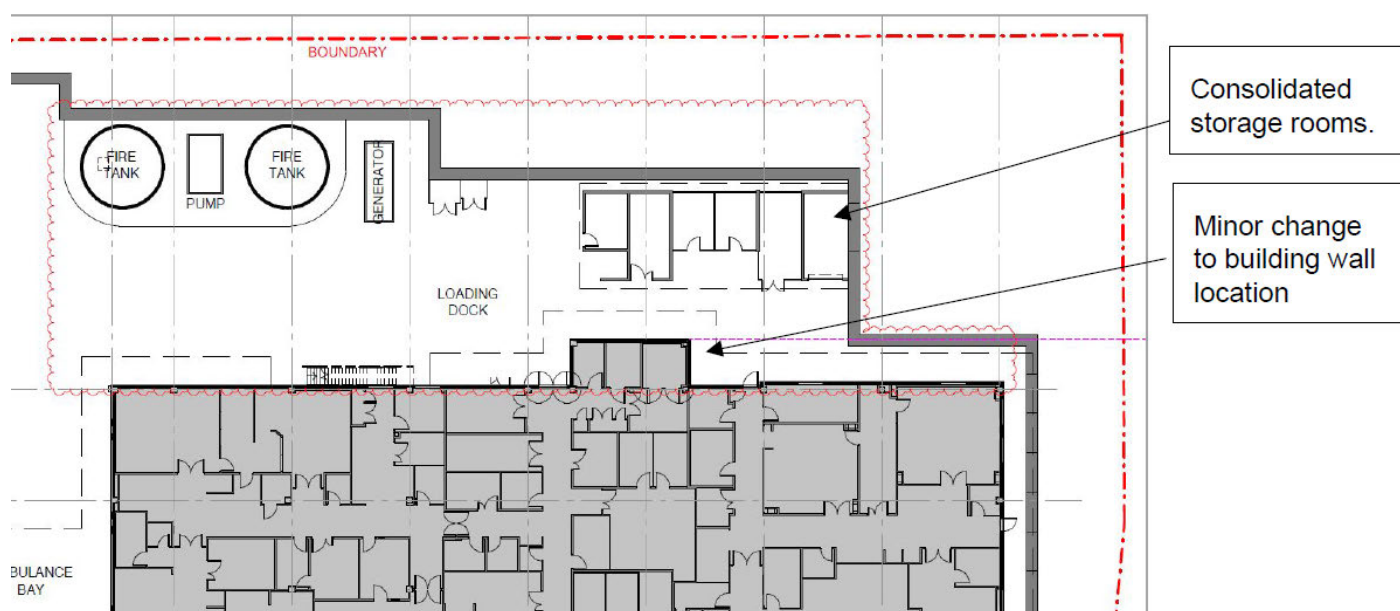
First Floor Plan – Proposed Amendment (Source DJRD Architects)
